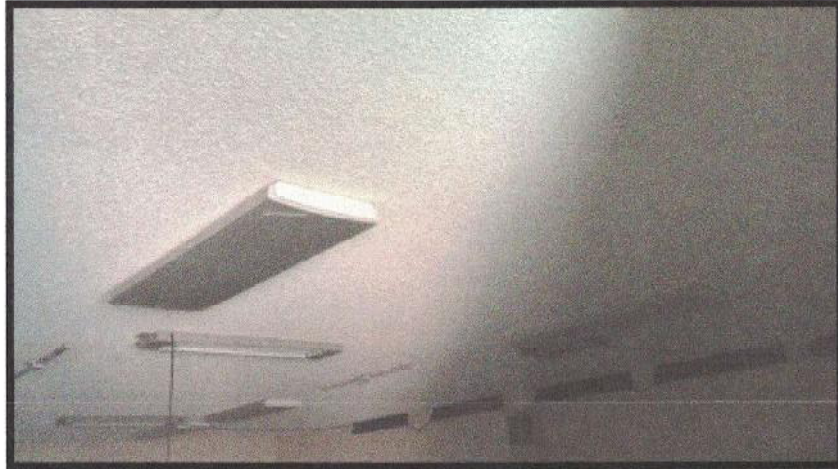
Painted popcorn ceiling texture, present on ceilings in the upstairs west apartment, stairwell, viewing rooms and chapel, is reported with a >1-2% chrysotile asbestos content. Viewing up inside the viewing room northwest addition.
